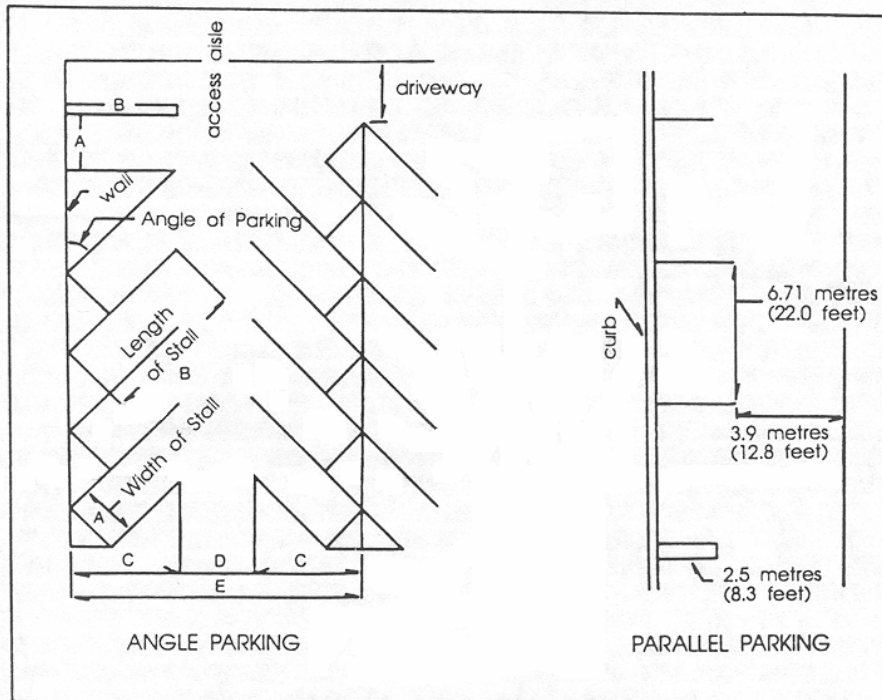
illustrates the parking space dimensions and requirements outlined in Subsections 4.1 and 4.3.
